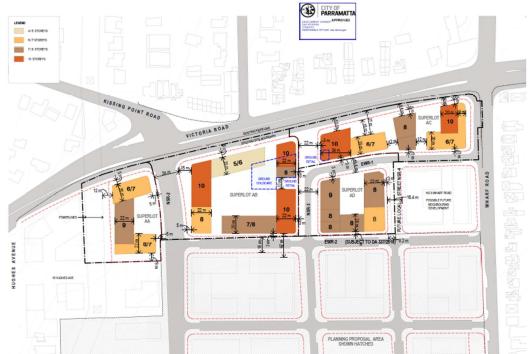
Approved Building Envelopes under Concept Plan MOD A (Source: AJC)
